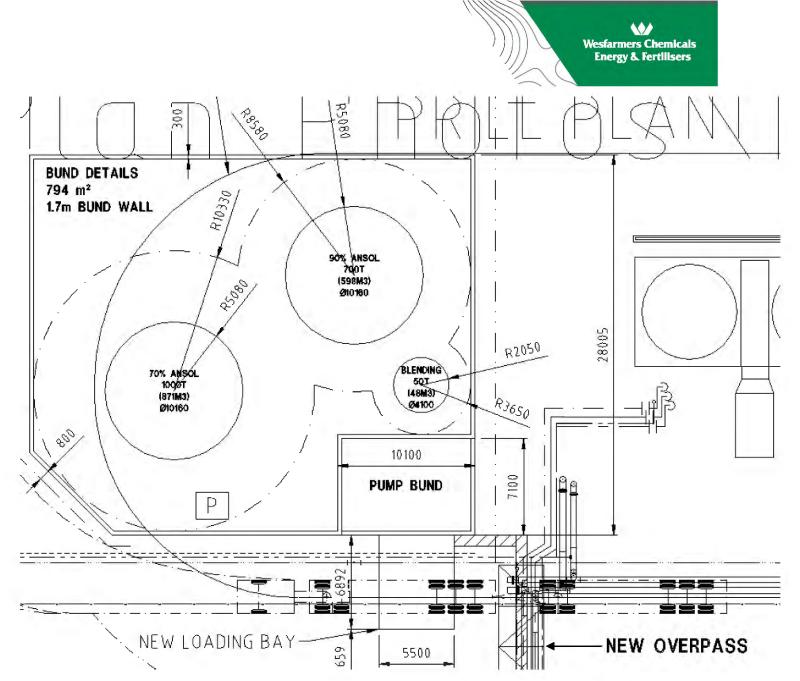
Detailed proposed ANSol storage tank layout and loading bay (being red rectangle excerpt from Figure 23)
